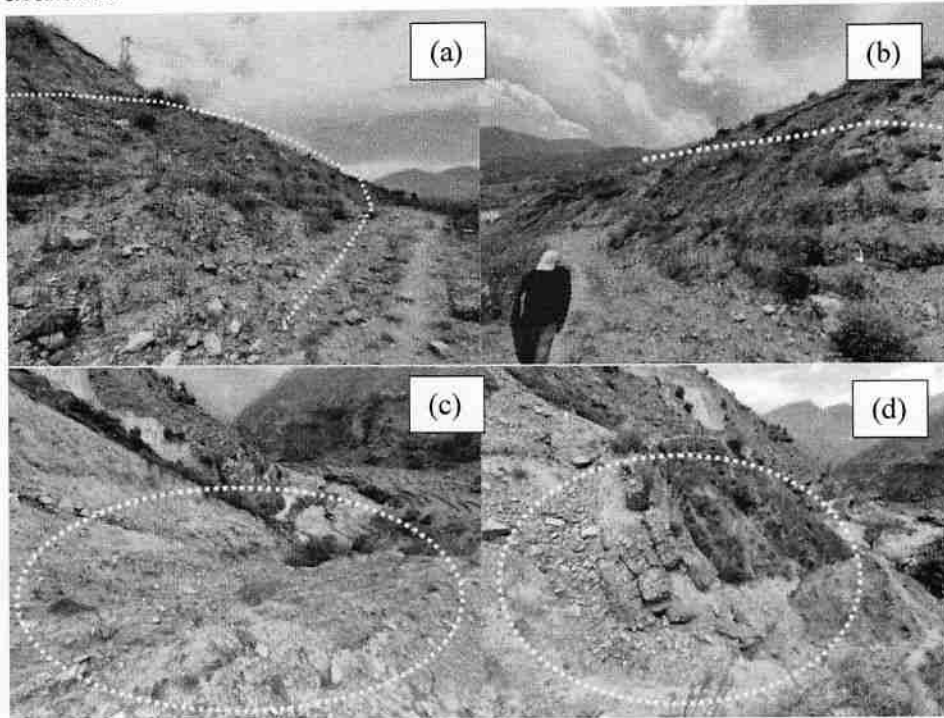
(a) and (b) showing proposed road alignment, (c) slope failure near proposed alignment, and (d) slope failure and damaged Gabions near proposed alignment.
